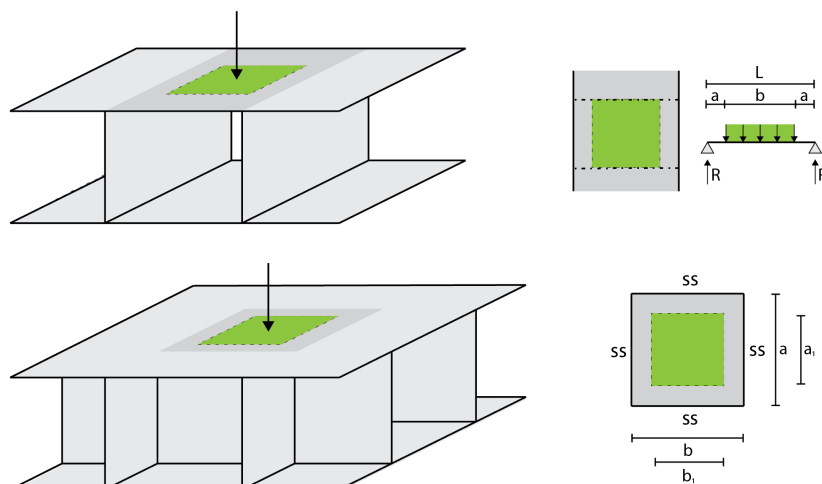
Top: schematization of the one-way floor. Bottom: schematization of two-way floor
